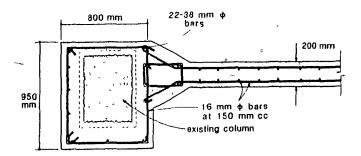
Cross-Sections of Members which were Strengthened to Eliminate Construction Joint.
